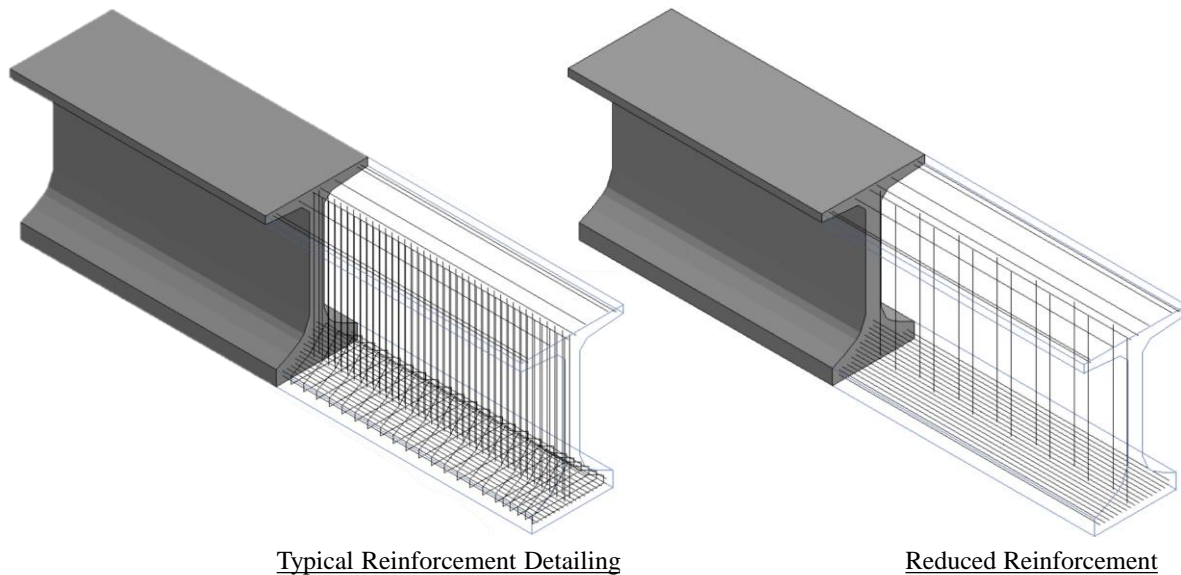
Examples of amount of reinforcement on FIB 72 mockup models
